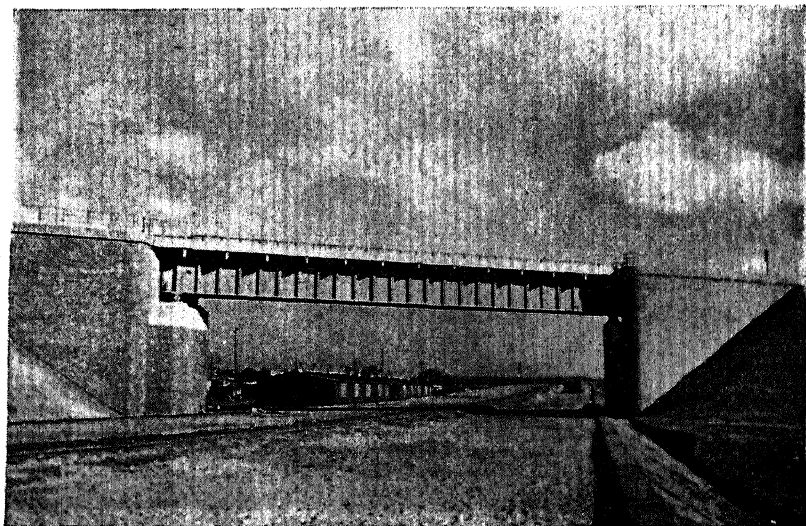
Plate girder type railroad bridge—one of more than two hundred all welded structures erected in Germany.
